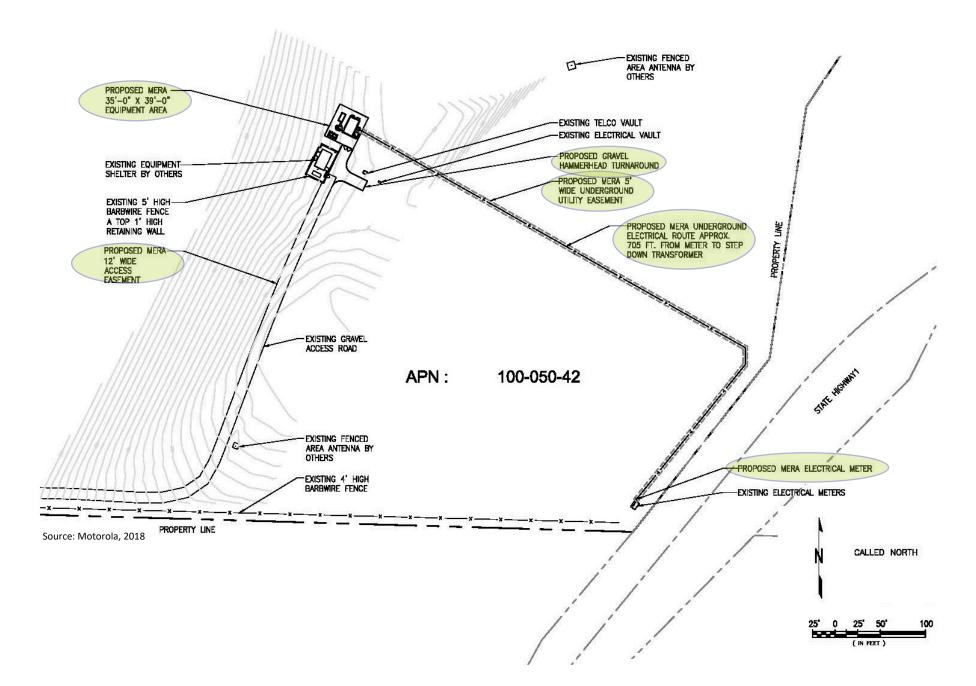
Site 20 - Tomales Enlarged Site Plan
